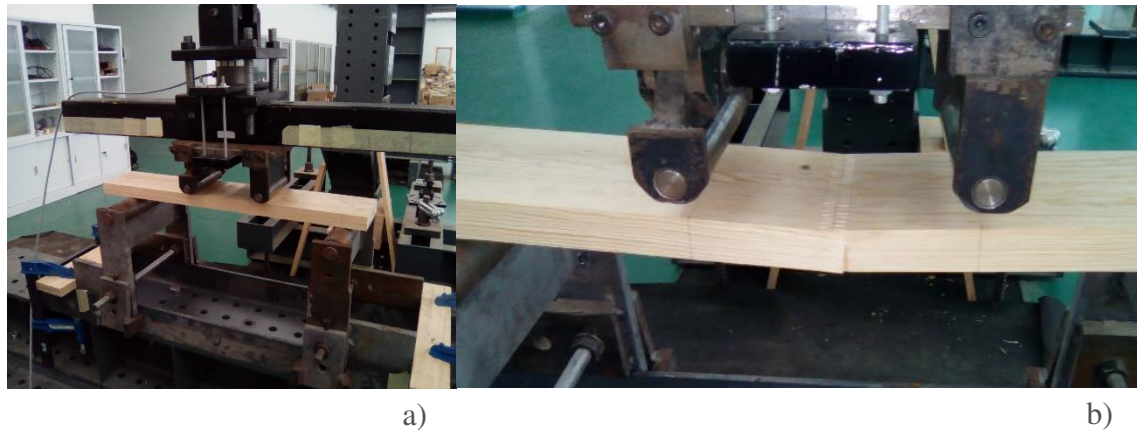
Bending tests of finger-joint connections: a) setup; b) failure.
